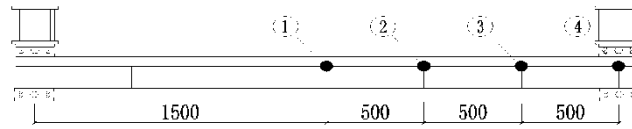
Slip measuring points arrangement of steel-concrete composite beam
